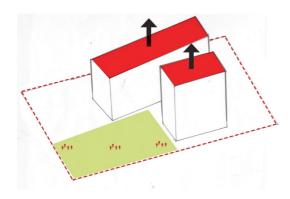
shows the building envelops which maintain existing building footprints. The proposed building height and floor space ratio is compliant.
